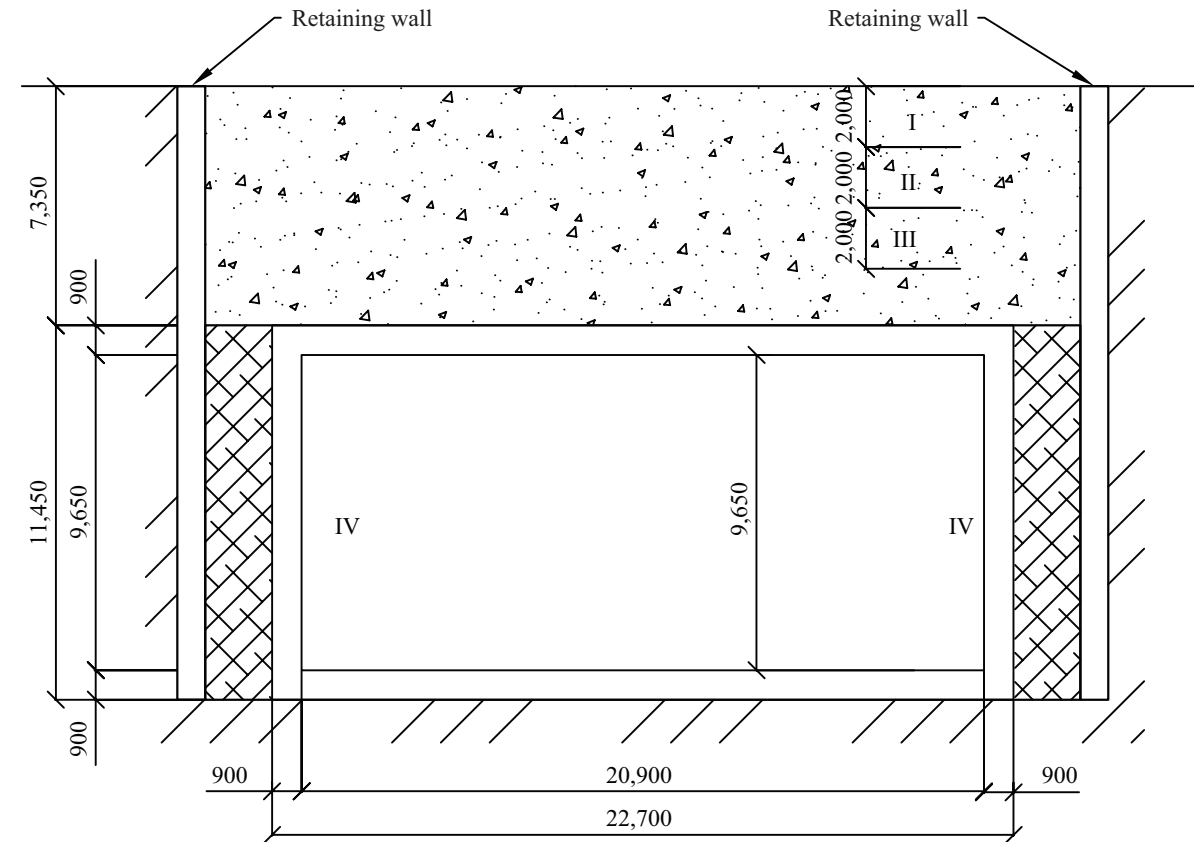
Cross-section of a characteristic underground station performed by open-cut backfill method
